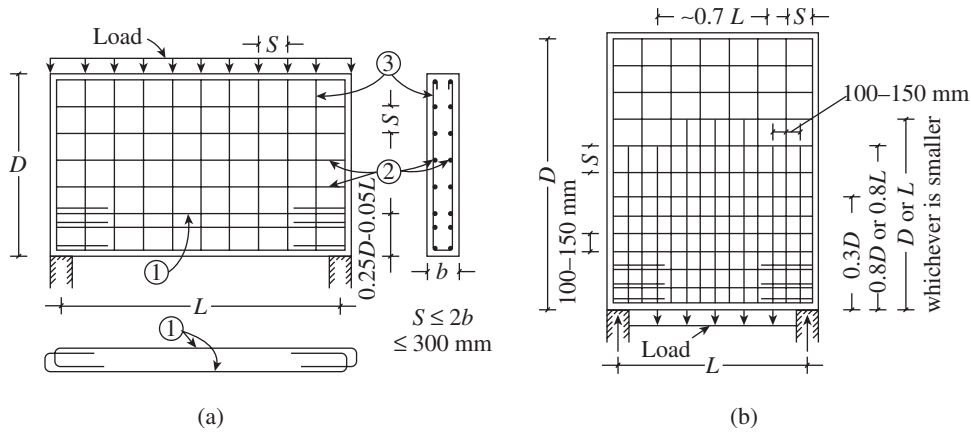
Detailing of reinforcement in simply supported deep beams (a) Loaded from top (b) Loaded from soffit
